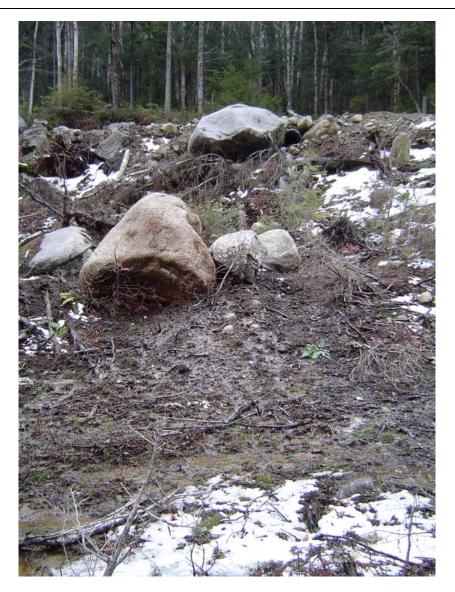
A: Typical area with a natural existing drainage swale with concentrated flow, which would receive additional culverts and potentially subdrainage. Photographed by A.F. 11/12/2003.
